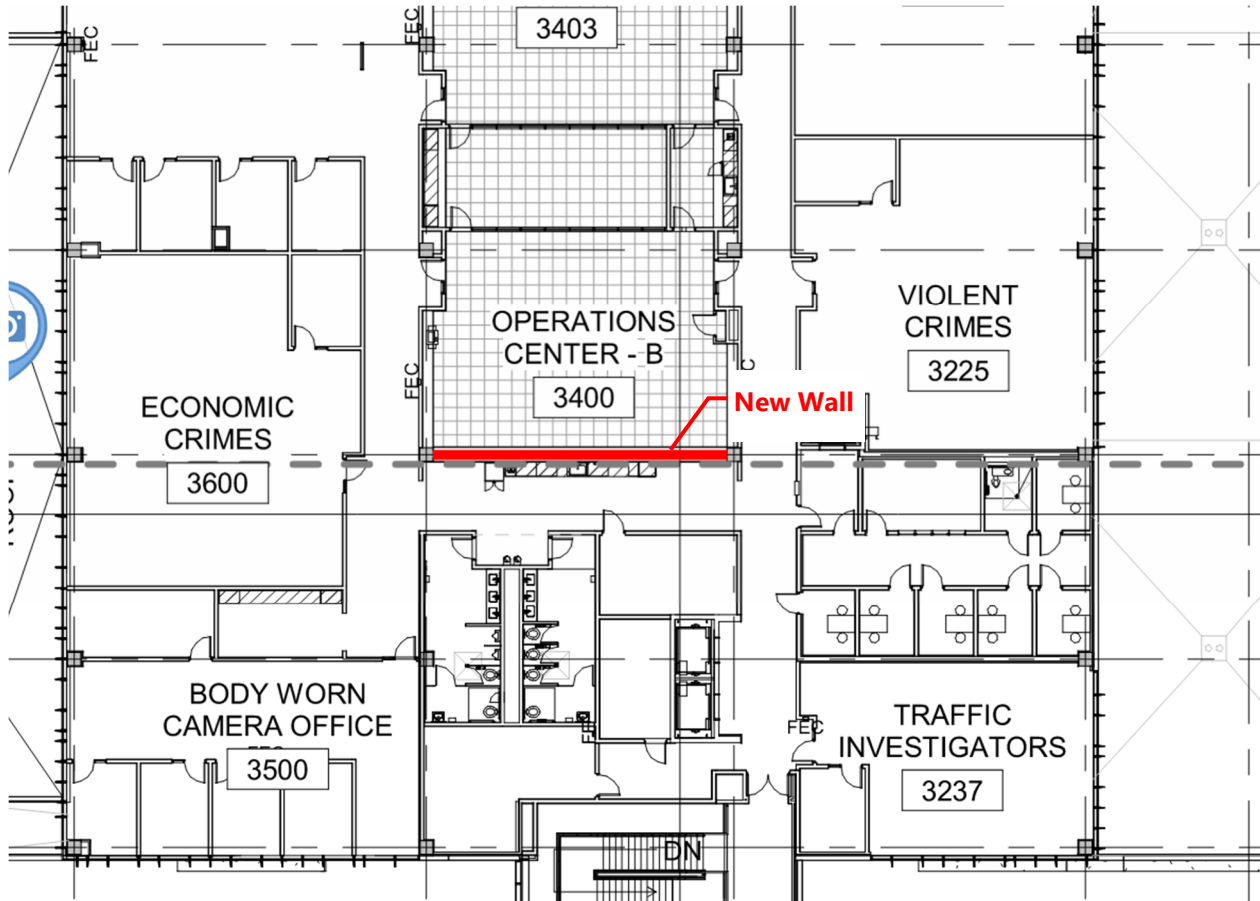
One potential location for the proposed new reinforced concrete shear wall
